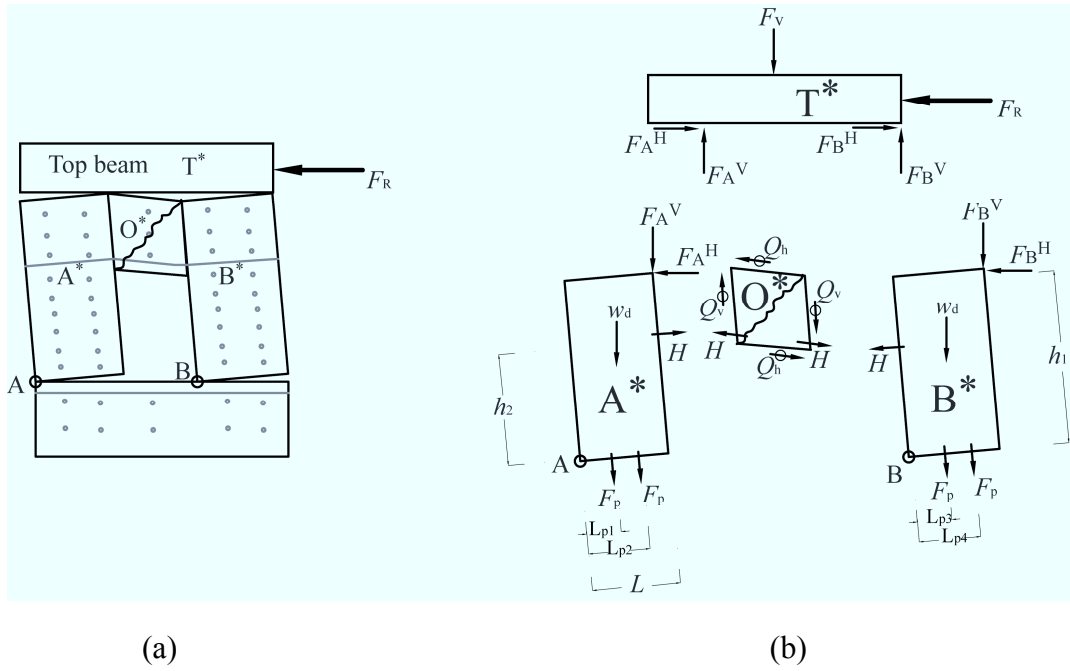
Weak beam-strong pier failure mechanism for RM specimen (a) Deformed shape, (b) Free body diagrams.
